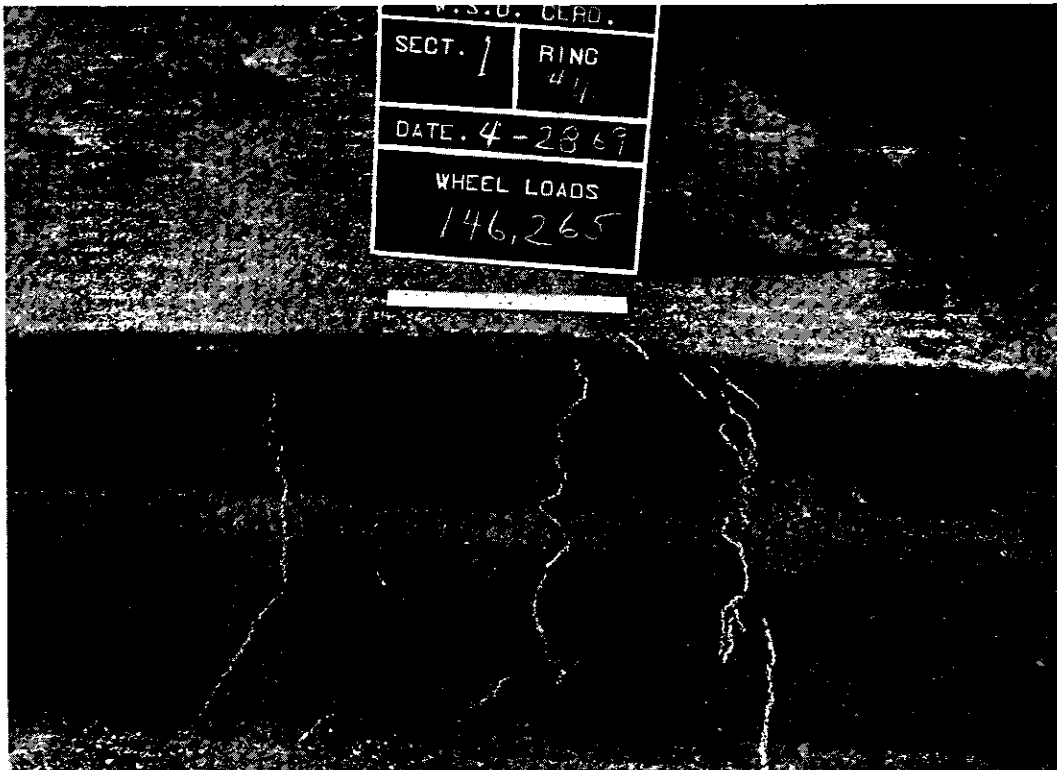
CLOSE-UP VIEW OF THE TRANSVERSE CRACKS IN SECTION 1 AFTER 146,265 WHEEL LOADS.
